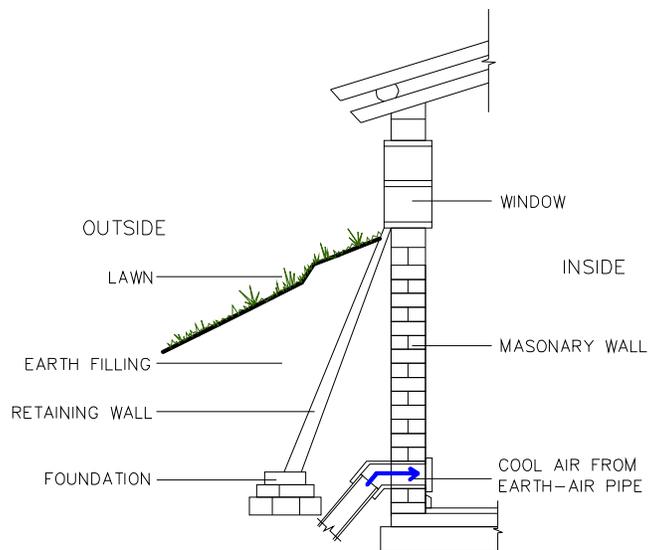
Section showing earth berm at the Dilwara Bagh House, Gurgaon
